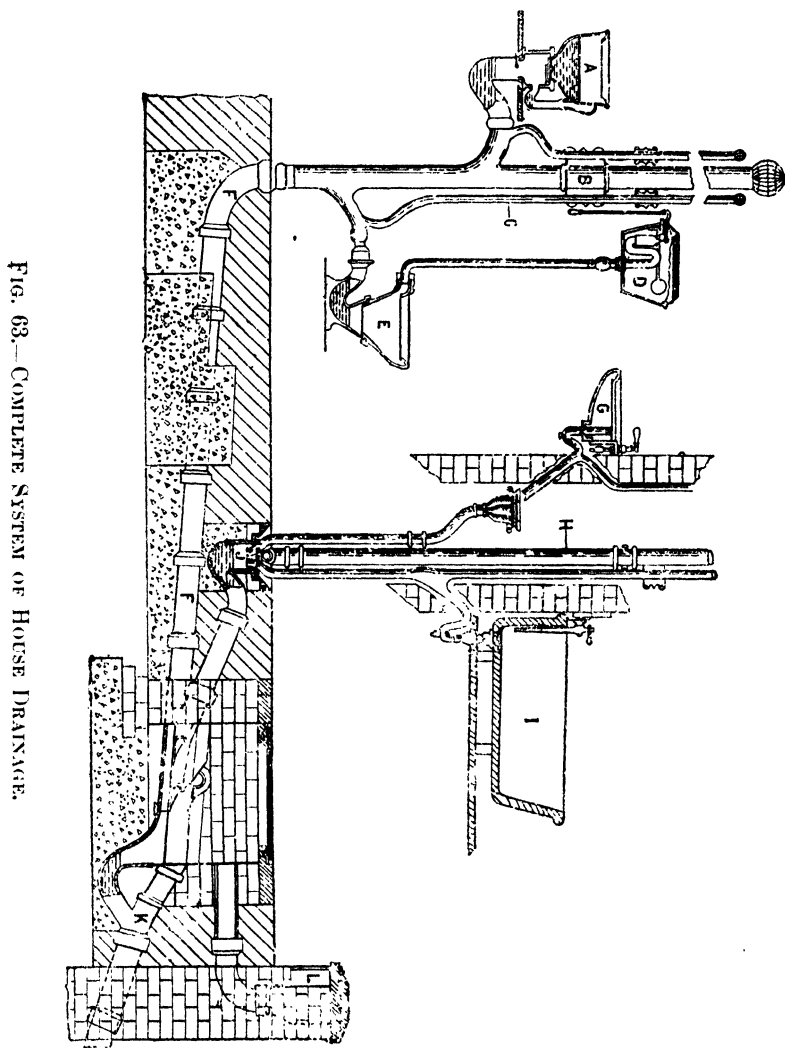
A Complete System of House Drainage. A and E are two closets which open into the soil pipe B; C, anti-siphonage pipe; D, flushing cistern opening into the closet E; F, house drain laid on a bed of concrete; H, rain water pipe; G, wash basin; I, bath tub. These empty into the gully trap J. K, intercepting trap placed in the manhole chamber intercepting the house drain from the sewer. L, inlet opening for ventilation. The soil pipe and the ventilating pipes are carried above the roof and are protected by wire gauze, they act as outlets
